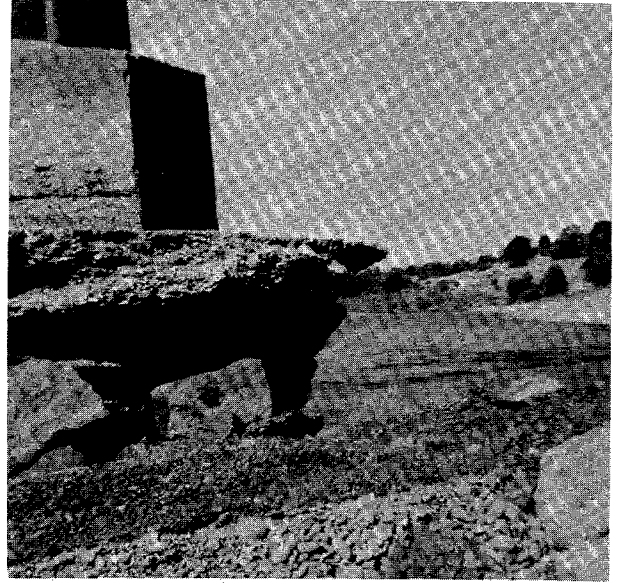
Scour around pier footing in 1970. (From Calif. Dept. of Transportation.)
